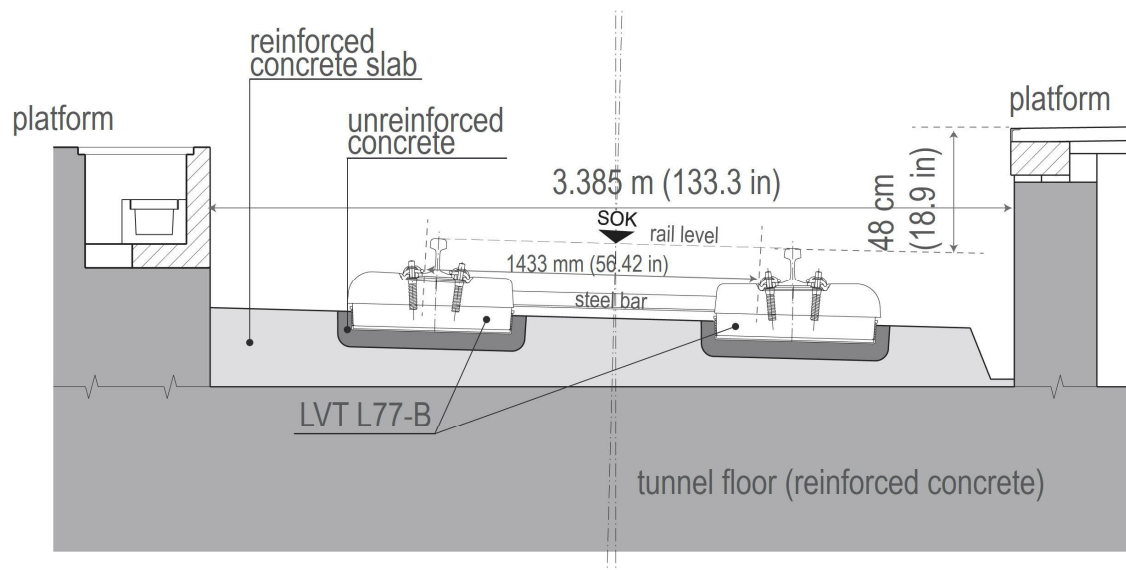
Fixed railway track at Zurich Airport station built in 1980
